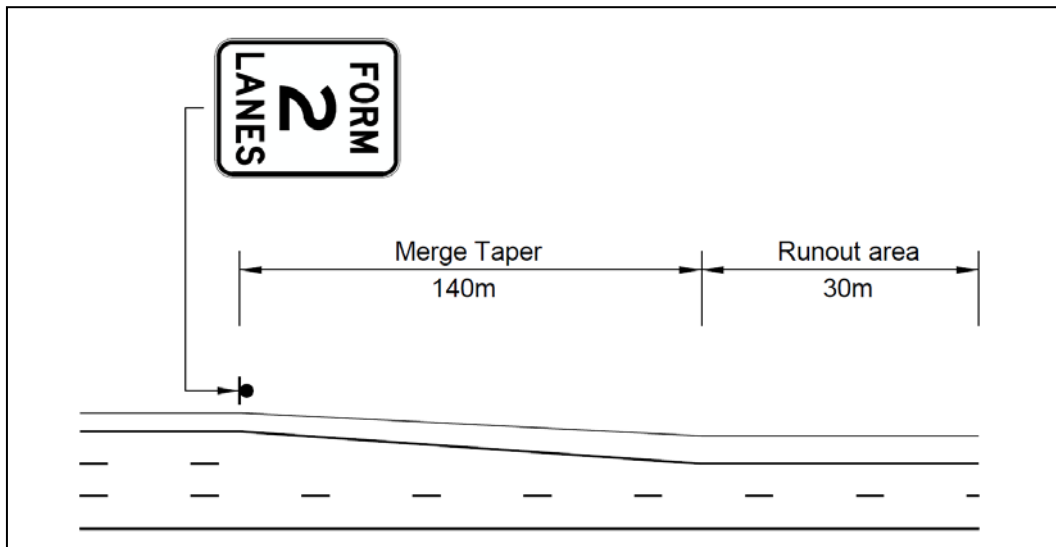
Site 6 - Newcastle Road - merge geometry
